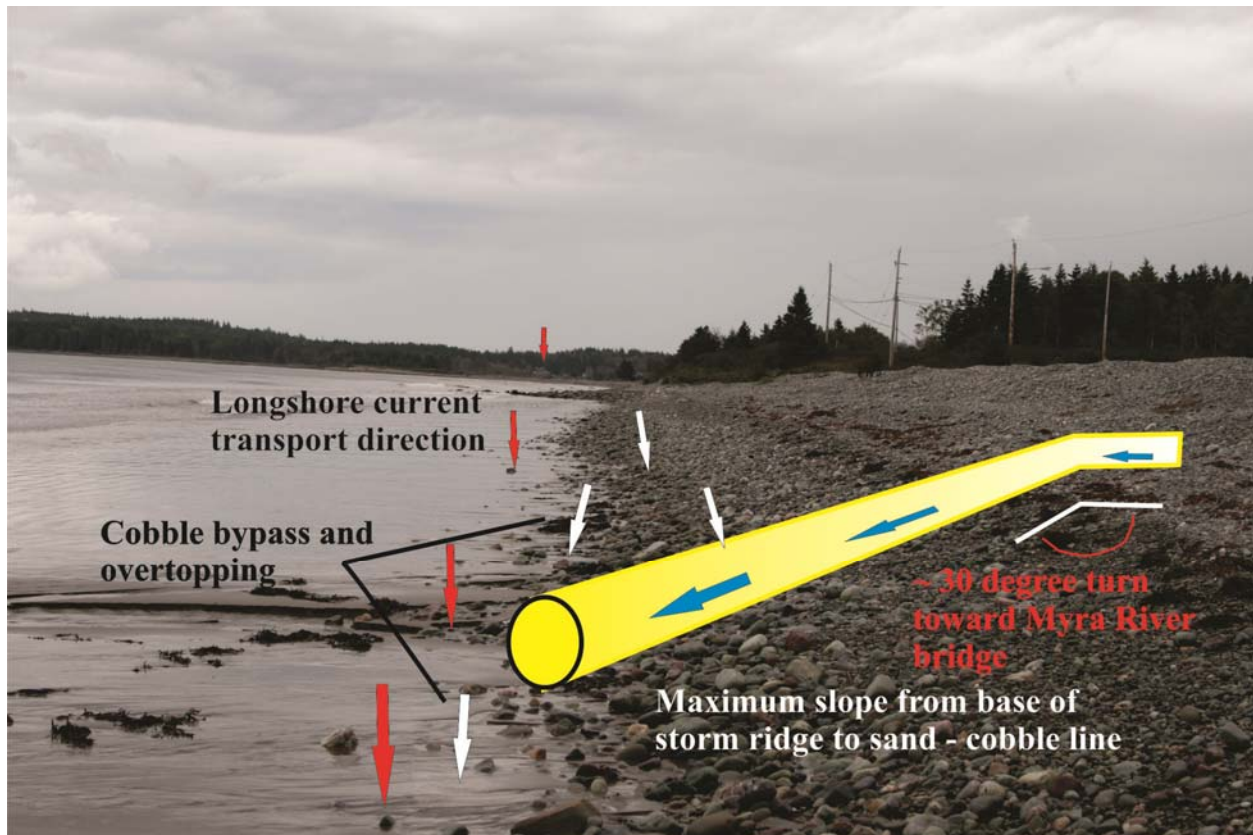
Placement of the extended culvert across the intertidal zone under the storm ridge.
